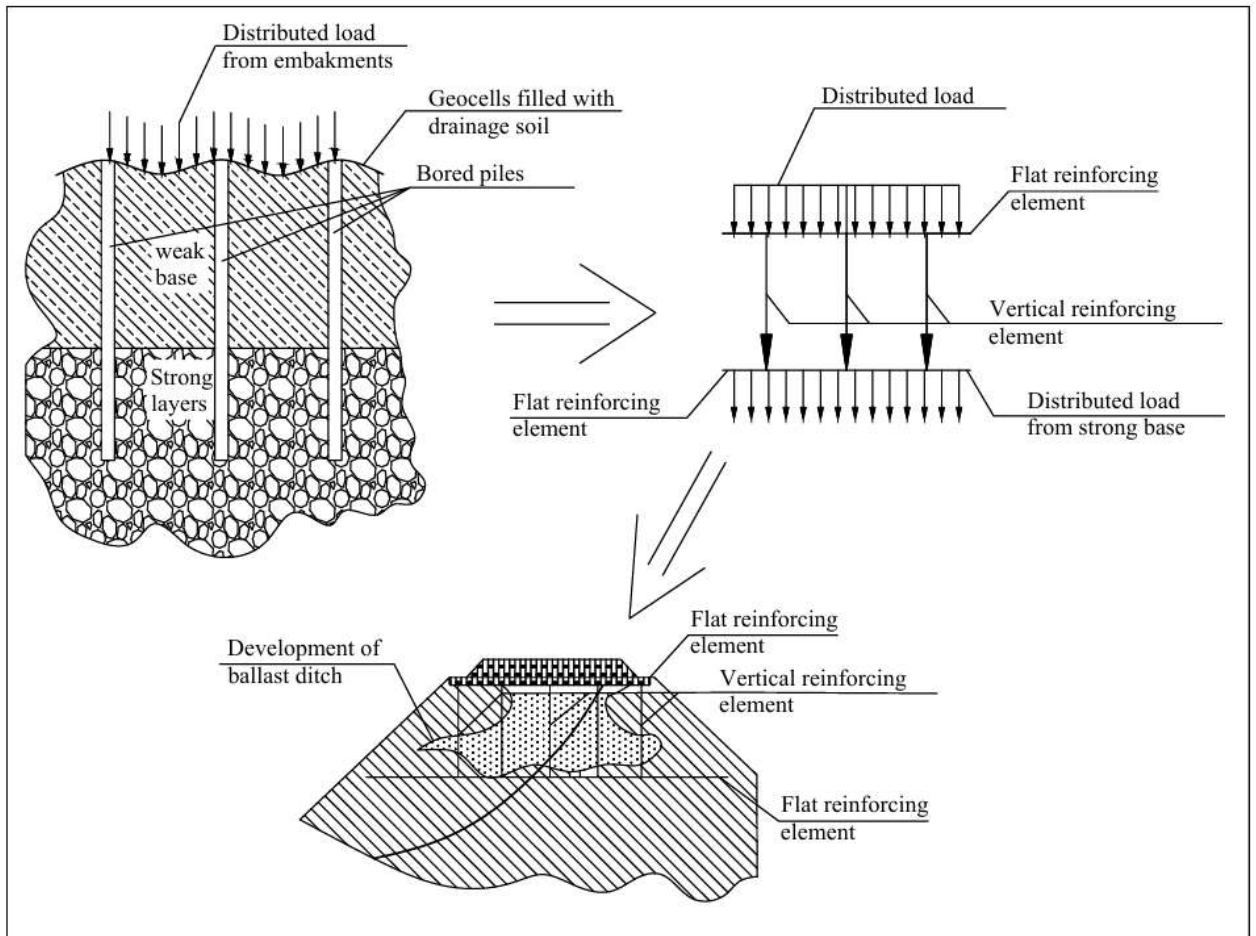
Arrangement of a three-dimensional reinforcing element in the embankment body.
